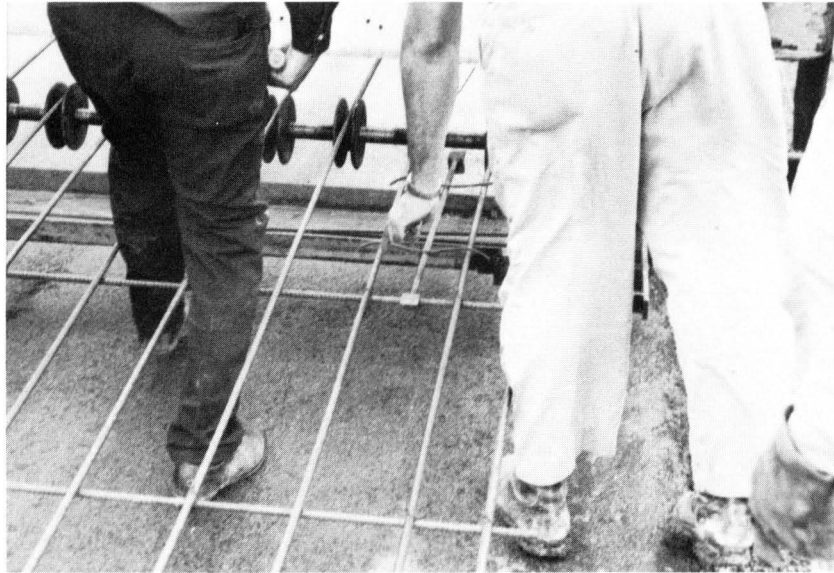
TIED DEFORMED BAR MAT EMERGING FROM MECHANIZED EQUIPMENT.
